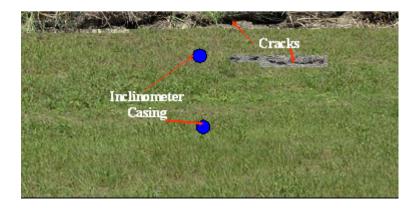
Approximate view of cracks in compost section formed in June 2008 at Joe Pool Dam
